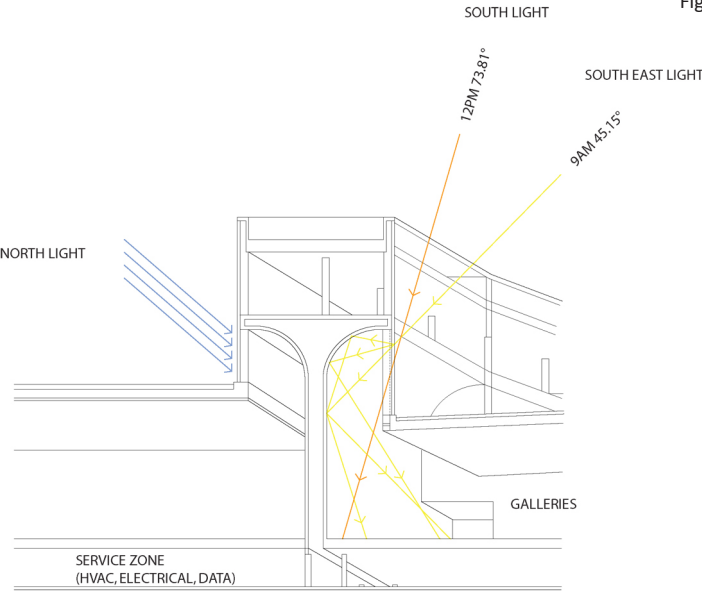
Structural Detail of the building showing how daylight enters the building (Ryan, 2008).
